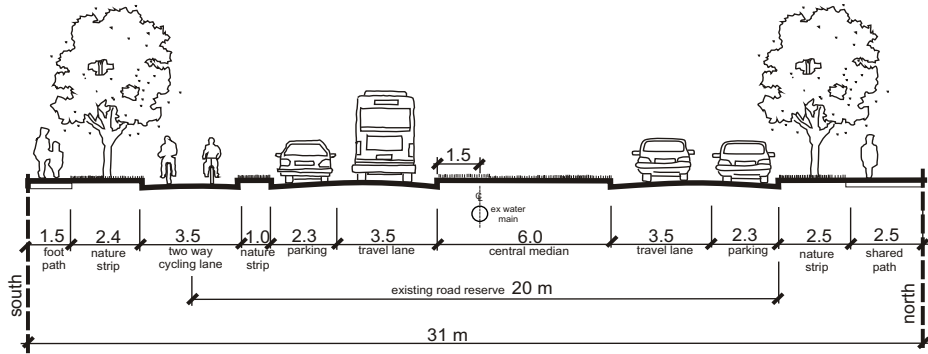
FIGURE H: BOUNDARY ROAD (WEST OF CONNECTOR C)
